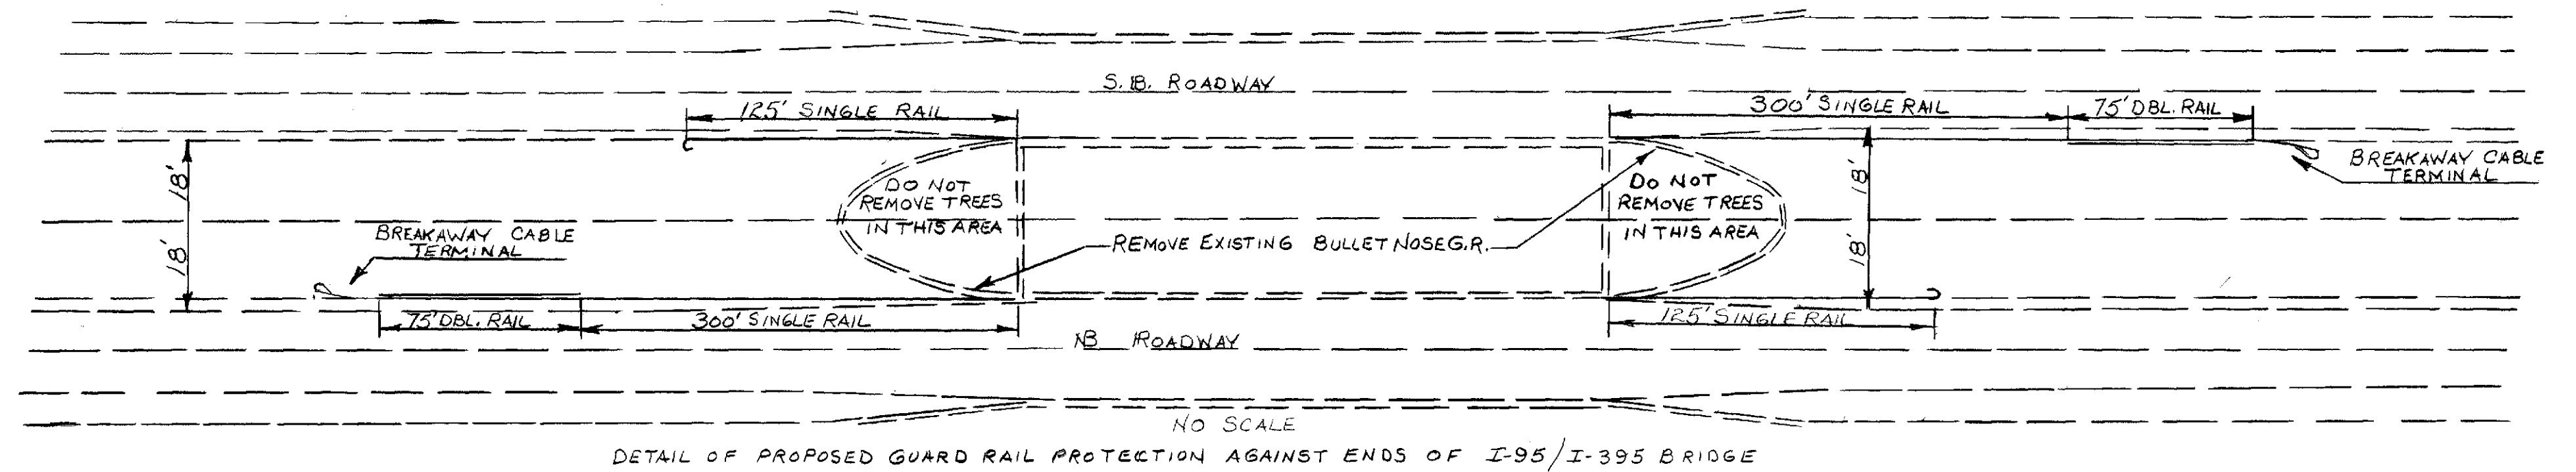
DETAIL OF PROPOSED GUARD RAIL PROTECTION AGAINST BRIDGE PIERS
